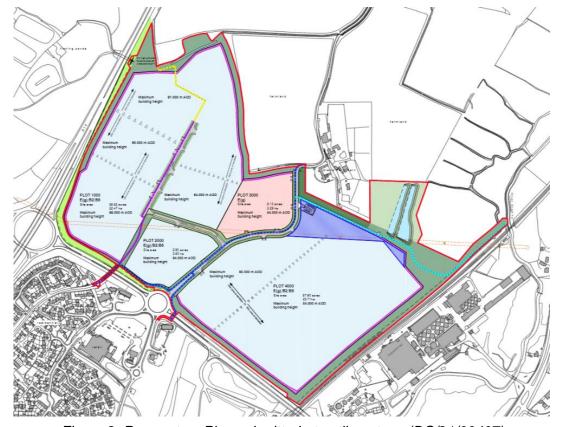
Parameters Plan submitted at outline stage (DC/21/00407)
